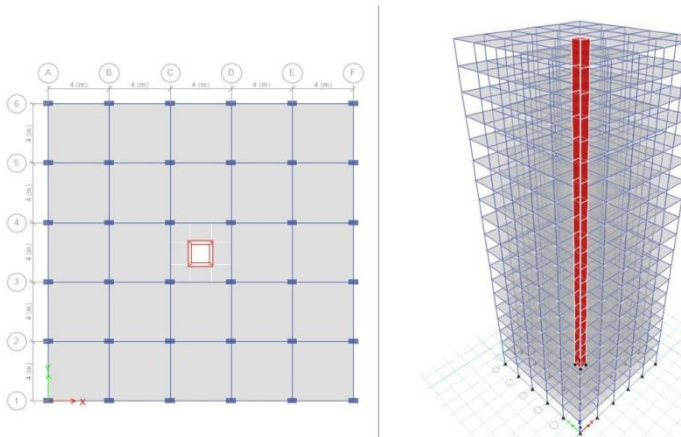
Diaphragm having opening at the centre with re-entrant corners having shear walls
